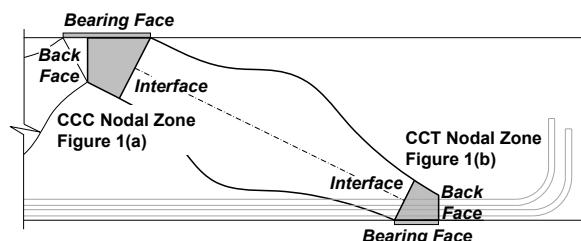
Strut-and-Tie Model for a Deep Beam
